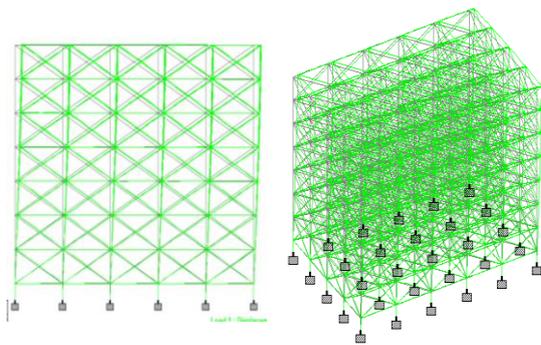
Deflected Shape of Frame with Infill wall Structure in X- direction
